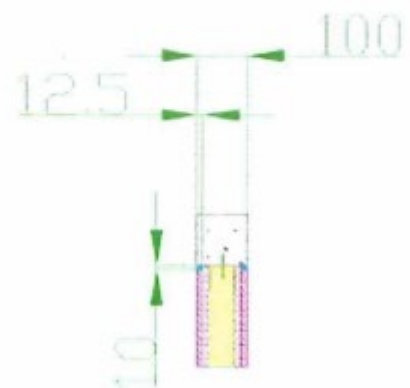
wall gypsum to stone thickness ≥ 100 mm
